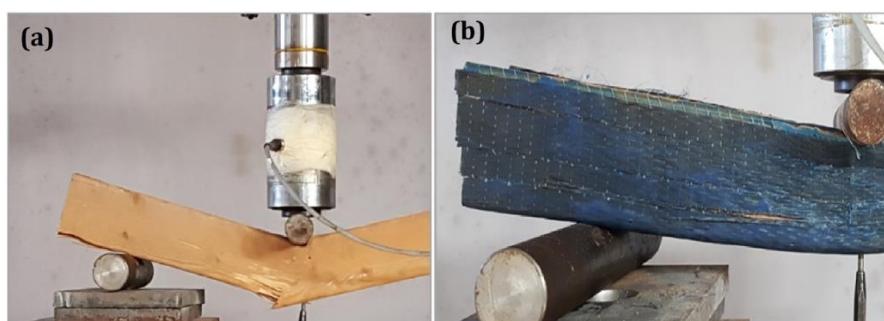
Failure modes (a) unreinforced beam, and (b) reinforced beam.
